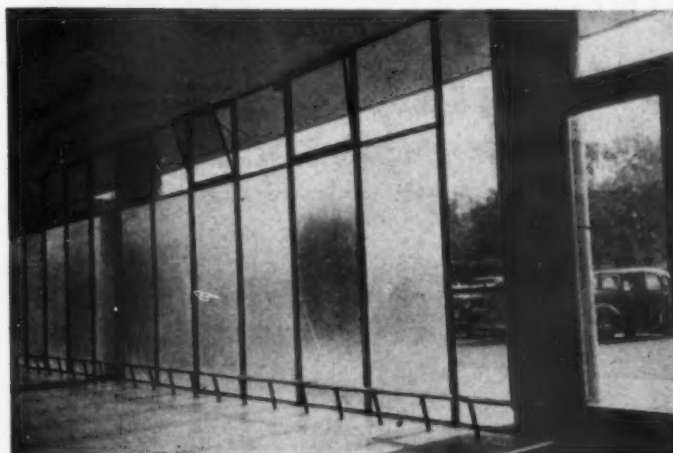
Guard rail at foot of glazing: LCC's Tulse Hill School, London.
